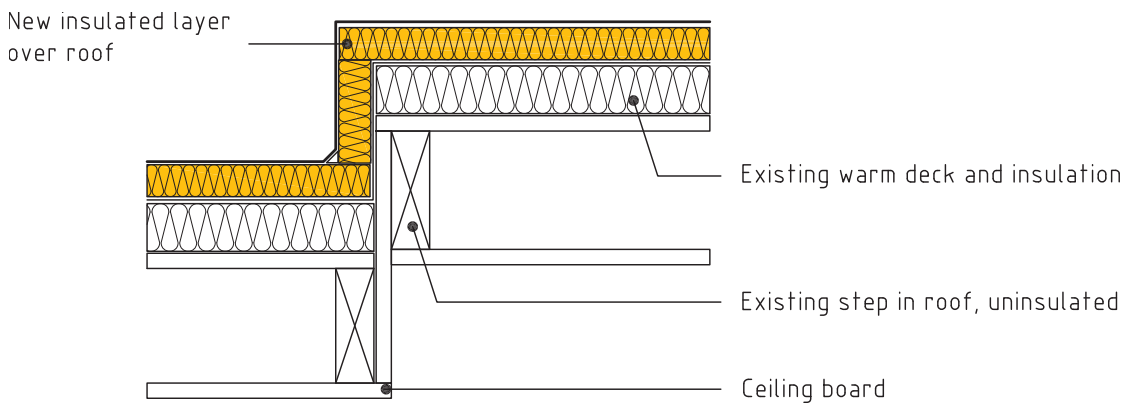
Stepped warm roof with insulation improved and added to step detail
